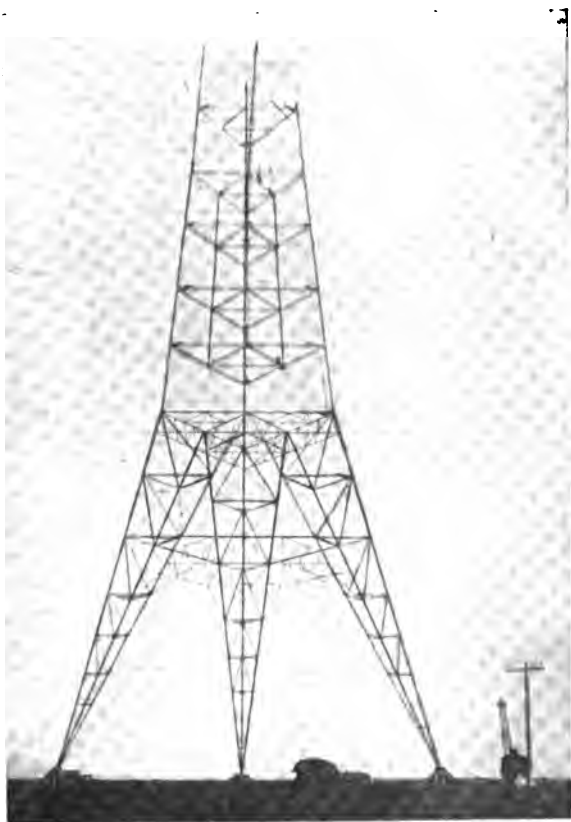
Erecting tower dismantled and being erected in place in main tower by 130-foot gin pole.
